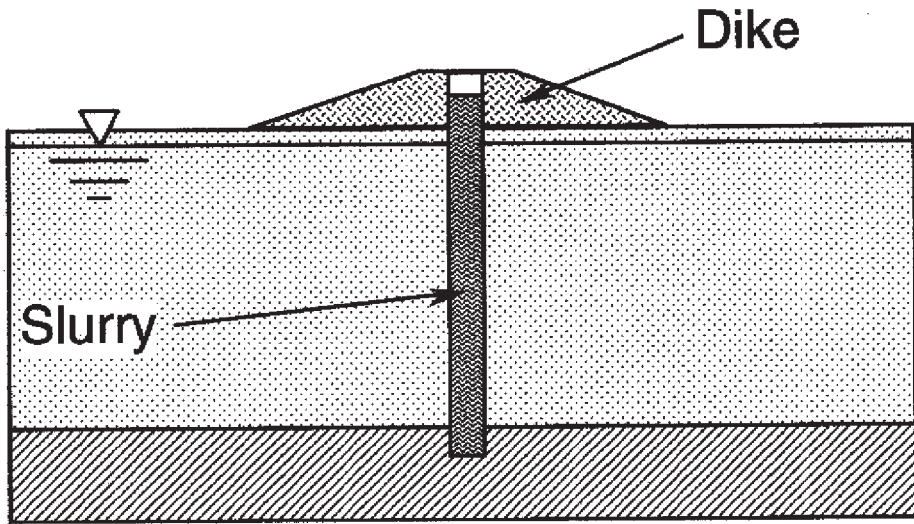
Construction of a Dike to Raise the Ground Surface for the Construction of a Slurry Trench.
